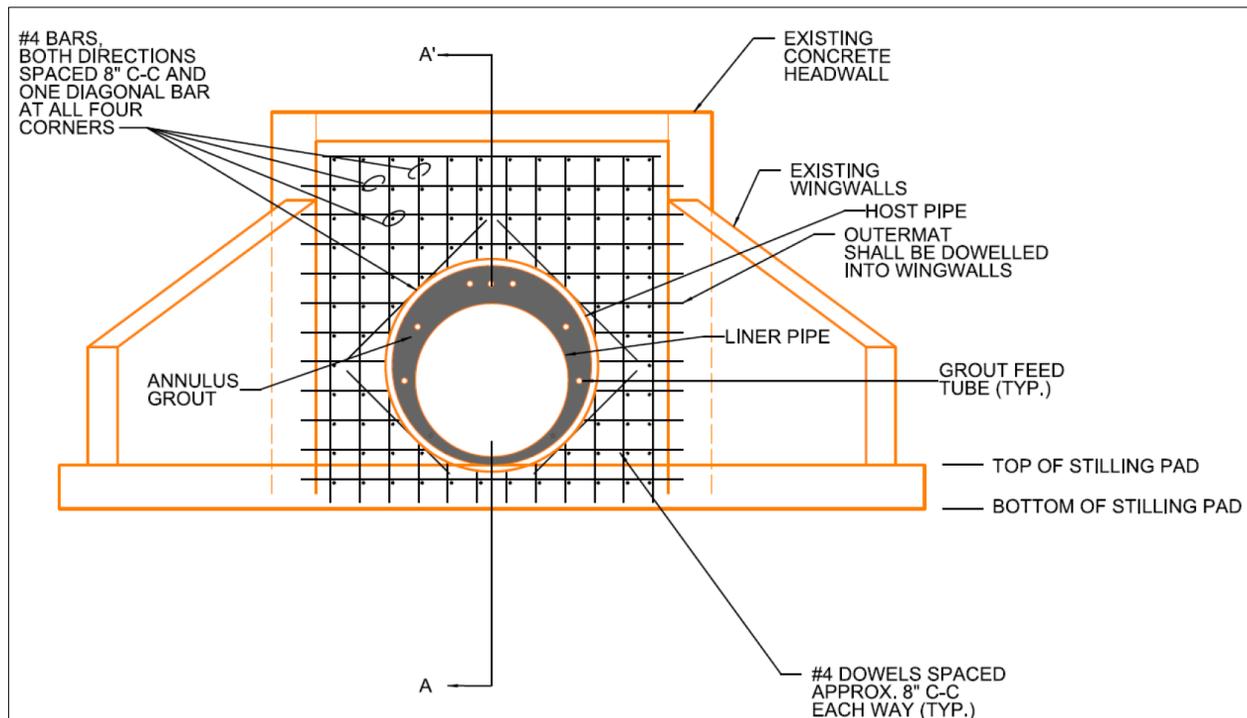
Elevation view of a modified inlet for a slip lined pipe.
